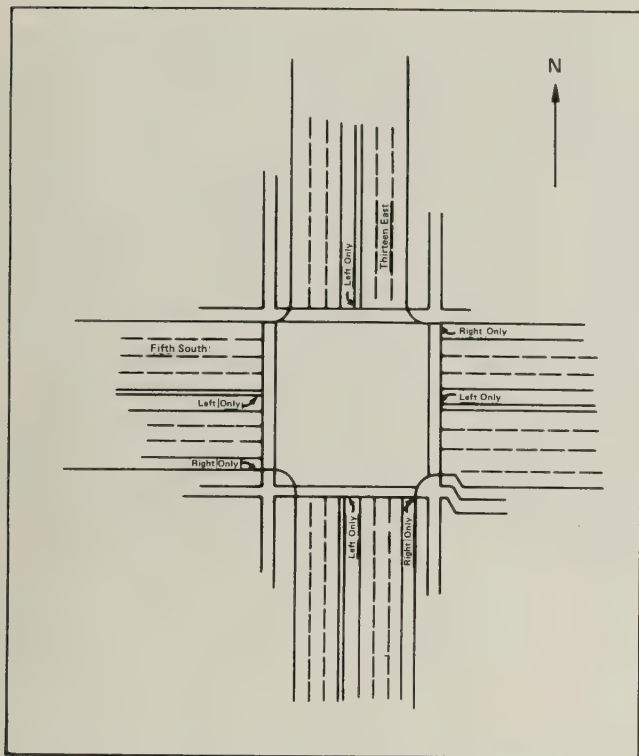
Intersection plan for 13th East and 5th South Streets.
